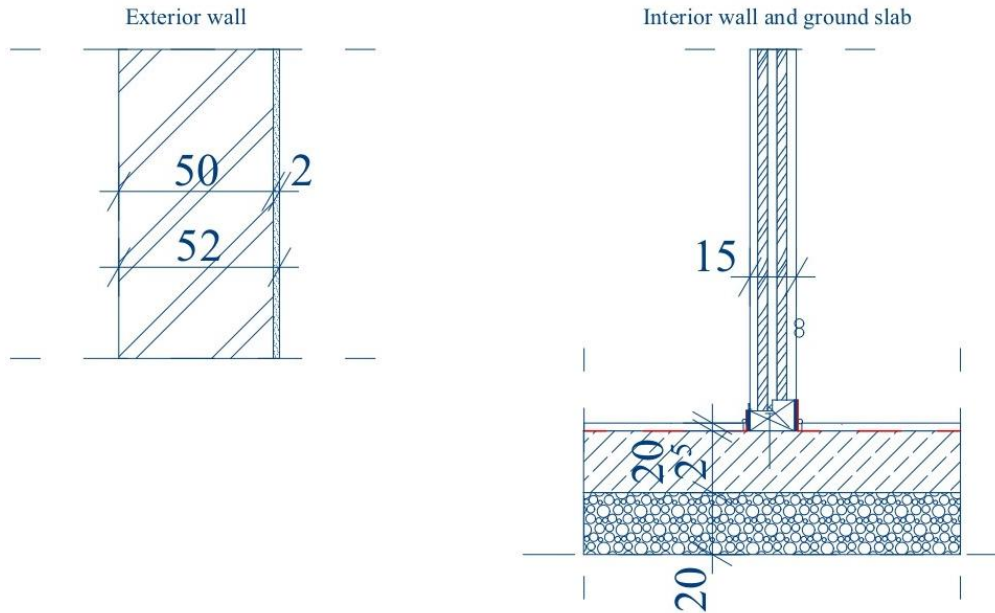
Sections of the construction inputs (Exterior wall, Interior wall and Ground slab)
